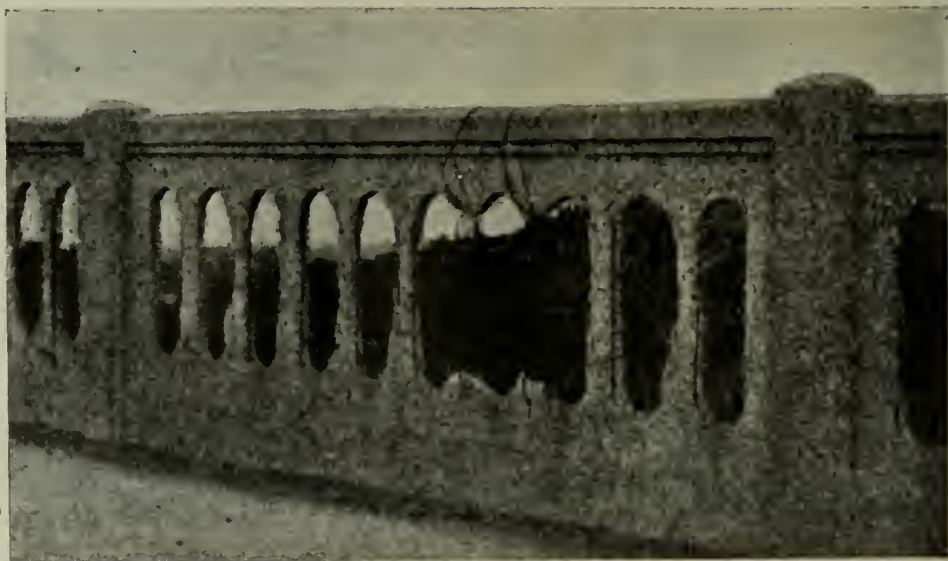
FAILURE ON NASHVILLE BRIDGE.
